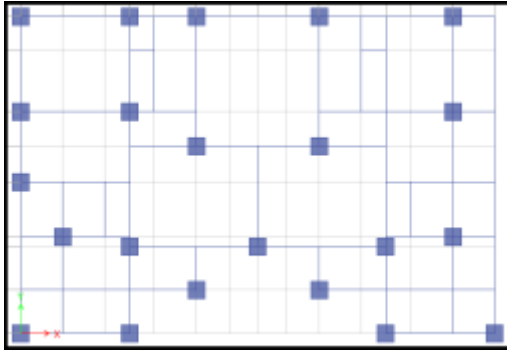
Plan showing structure without shear wall with Four concentric shear wall
